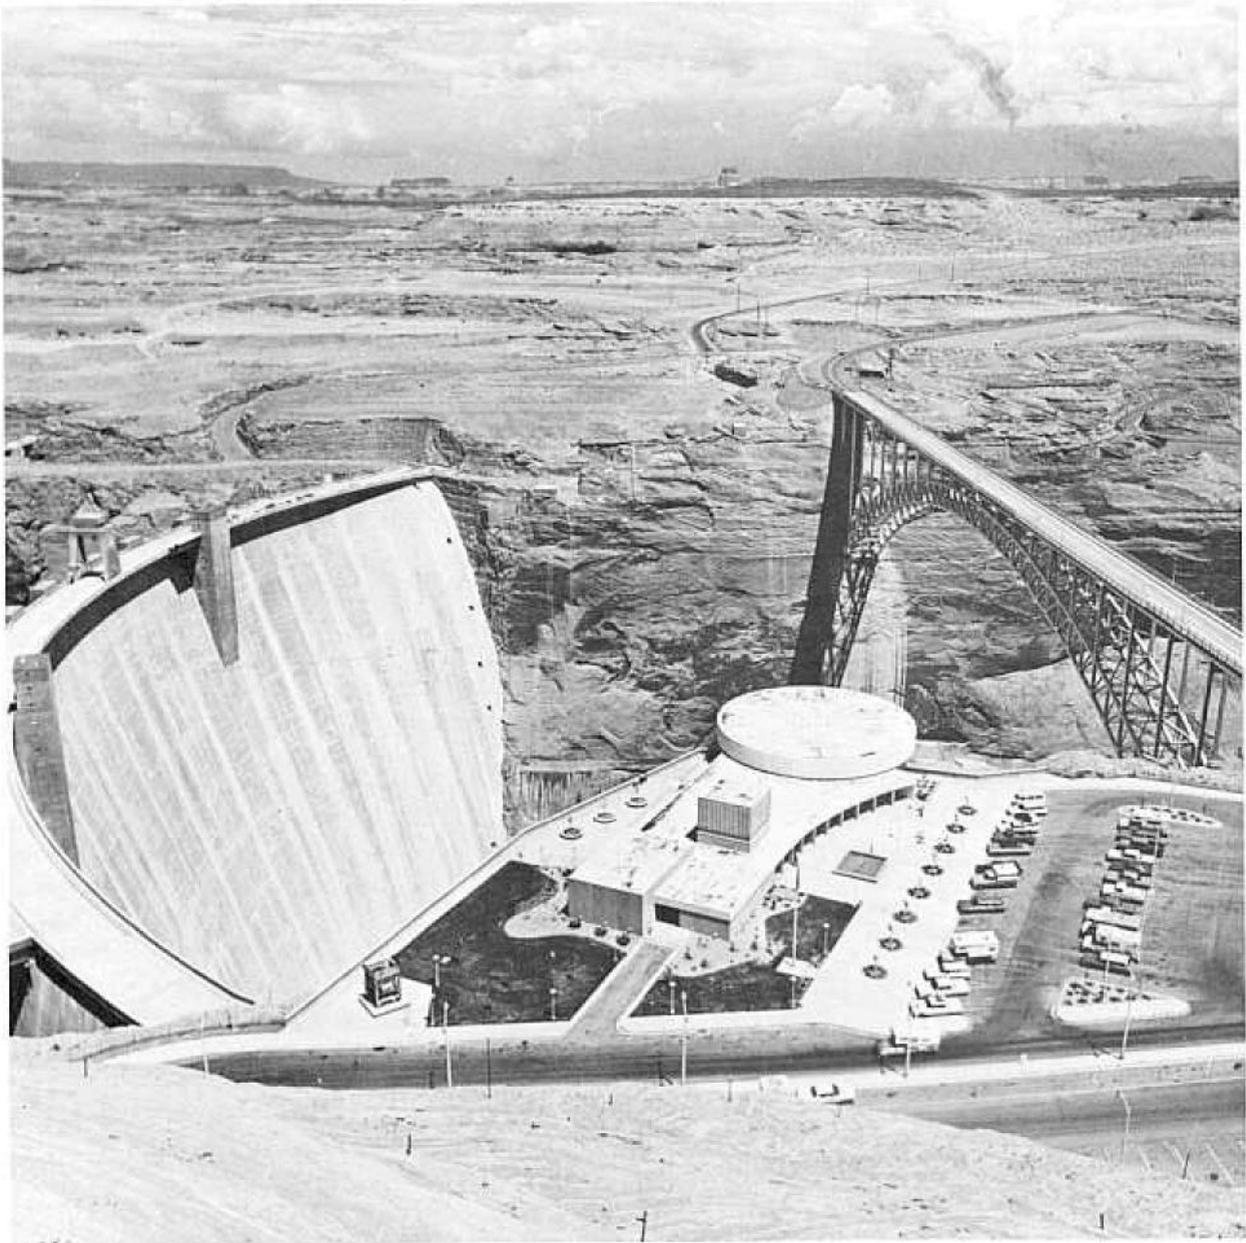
Viewing area at Glen Canyon Dam in Arizona.—P557-400-1133
